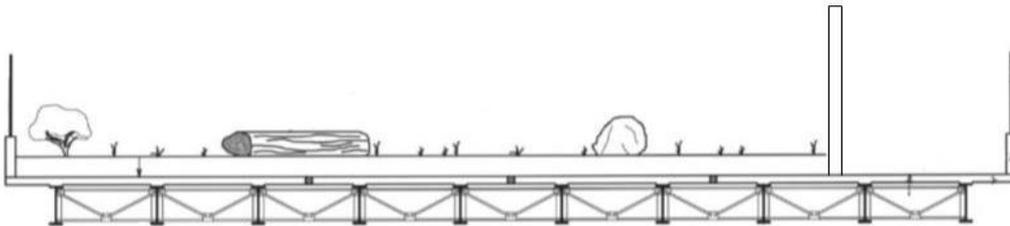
Cross section of wildlife overpass with divided pedestrian walking path on the right side.
